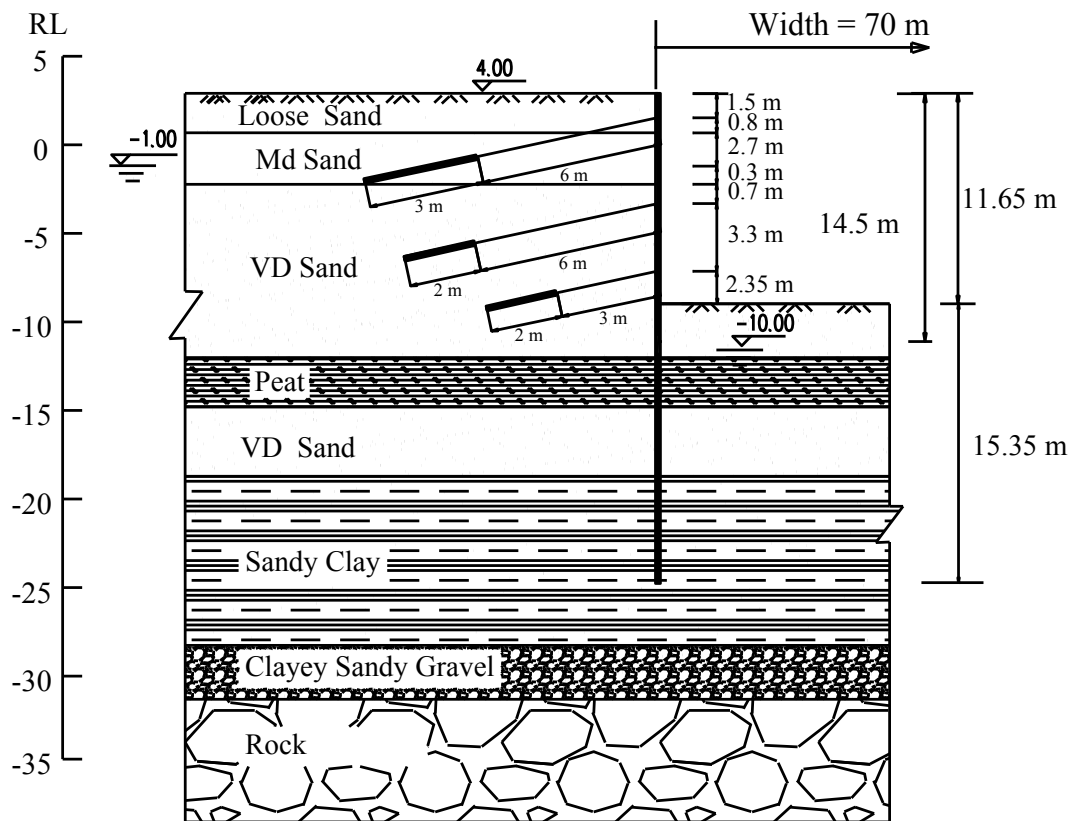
Details of secant pile wall for Circle on Cavill System.
